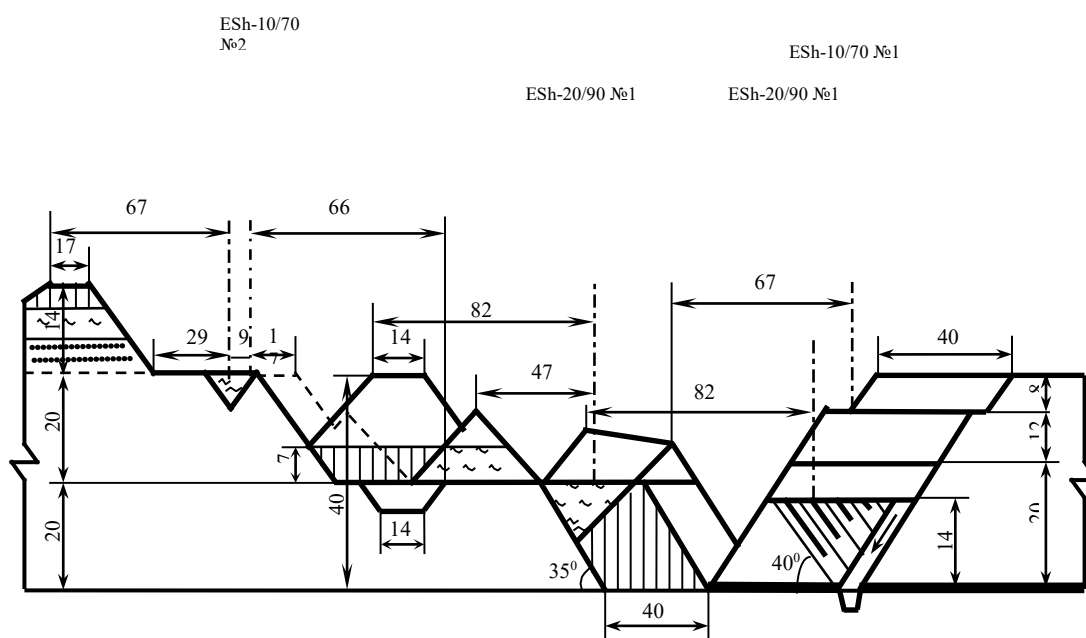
Flow sheet of overburden rock development with forming of inclined draining trench (flow sheet 6)
